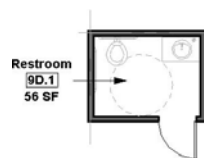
Module 9D: Front of House Restroom – Floor Plan
